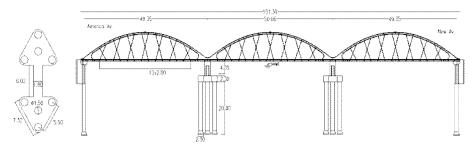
Plan view of the pile head (left) Longitudinal view of the arches (right).
